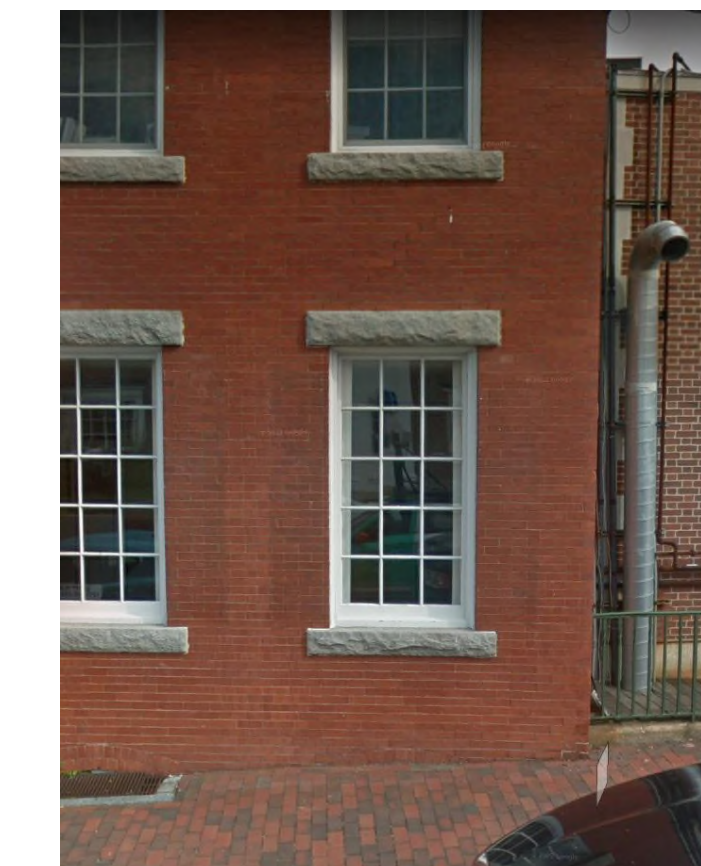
IMAGE OF EXISTING WOOD WINDOW TO BE REPLACED BY NEW WOOD DOOR AND TRANSOM WITH DIVIDED LIGHTS
